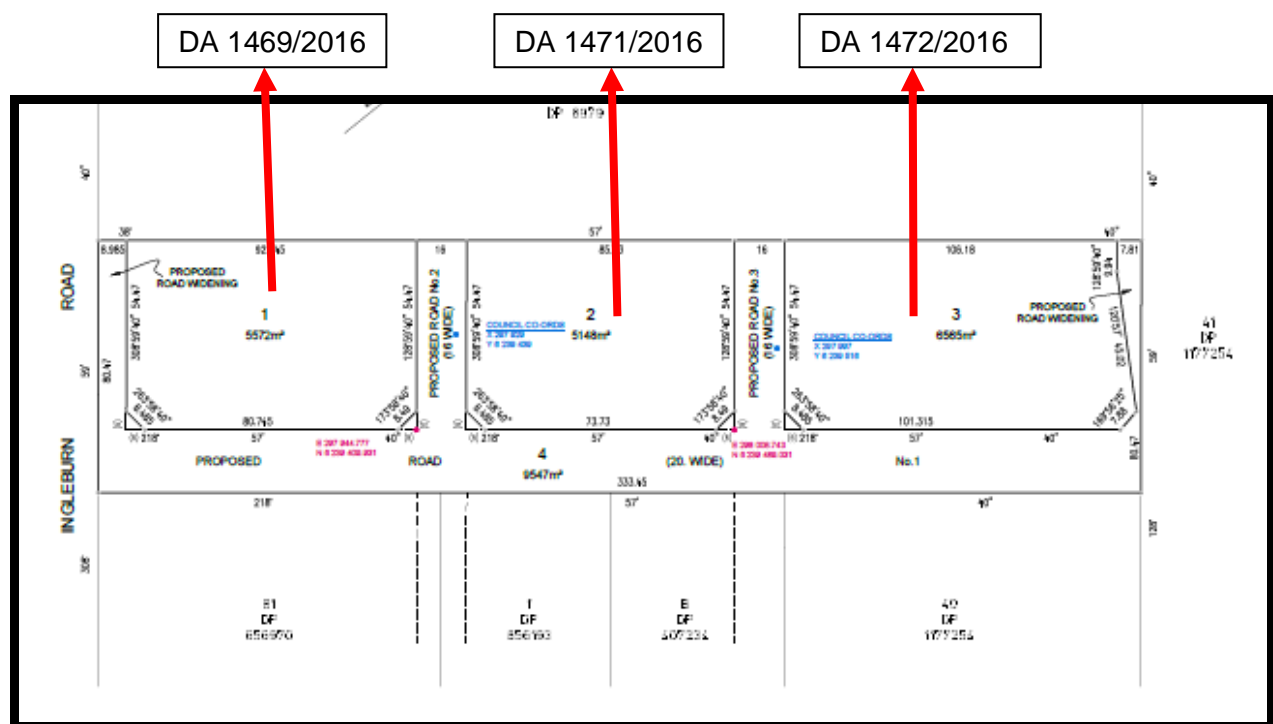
Current plan of three lot Torrens title subdivision and construction of roads as per DA / 1468/2016.
